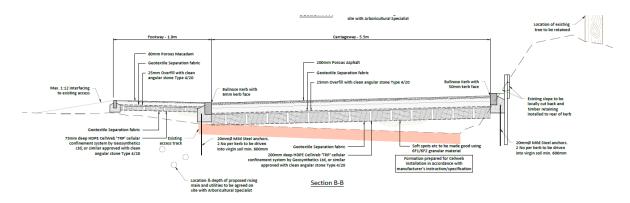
Extract of cross sections prepared by Structa for access road next to tree T16.
